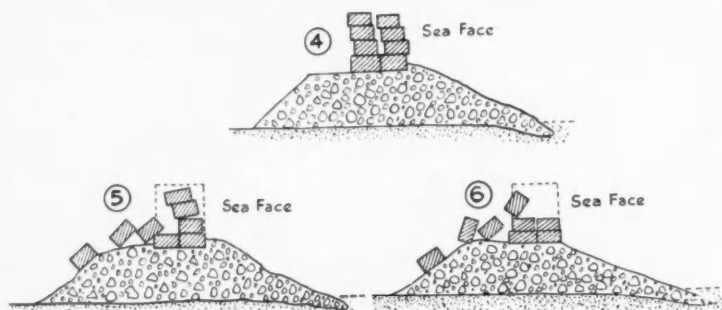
Sketch showing sections (4, 5 and 6) of face after the storm.
